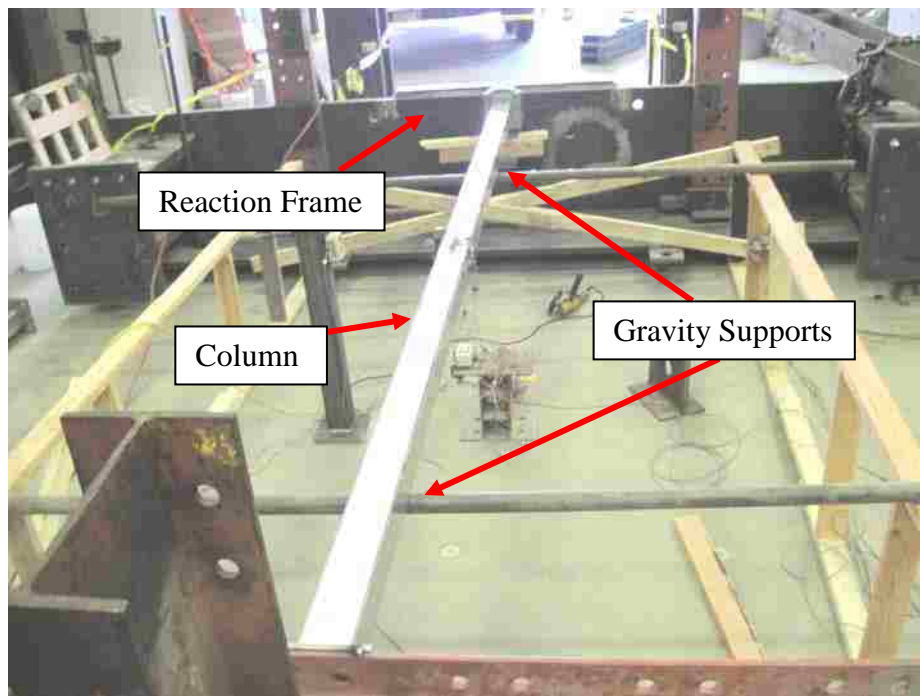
Photo of Steel Reaction Frame for Test to Failure
